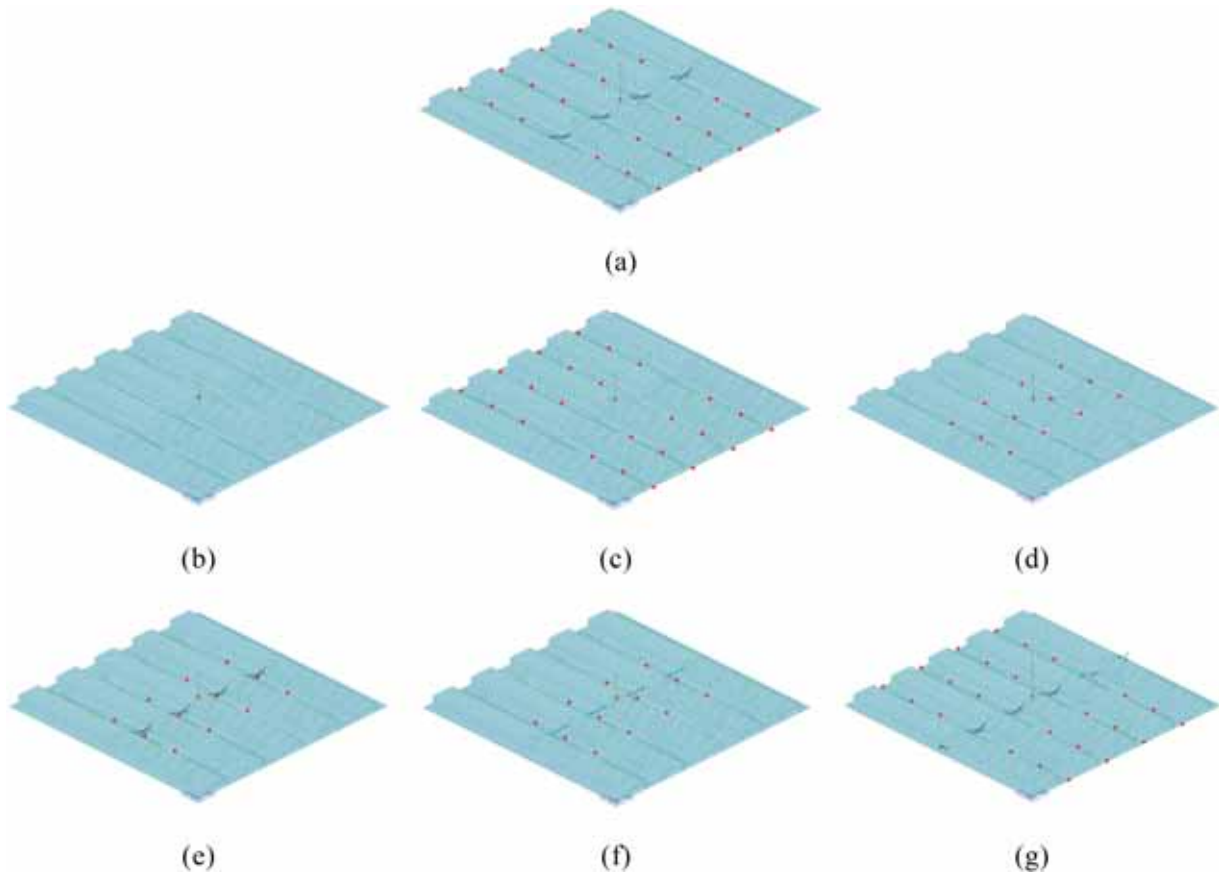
Different transverse restraint conditions of the deck: (a) baseline deck with six flange edge welds and crosses transverse beam; (b) fully independent floor elements; (c) six flange edge welds; (d) three flange central welds; (e) three flange central welds and crosses transverse beams; (f) three flange central welds and struts transverse beams; (g) six flange welds and crosses transverse beams also connected with the edge cladding beam
